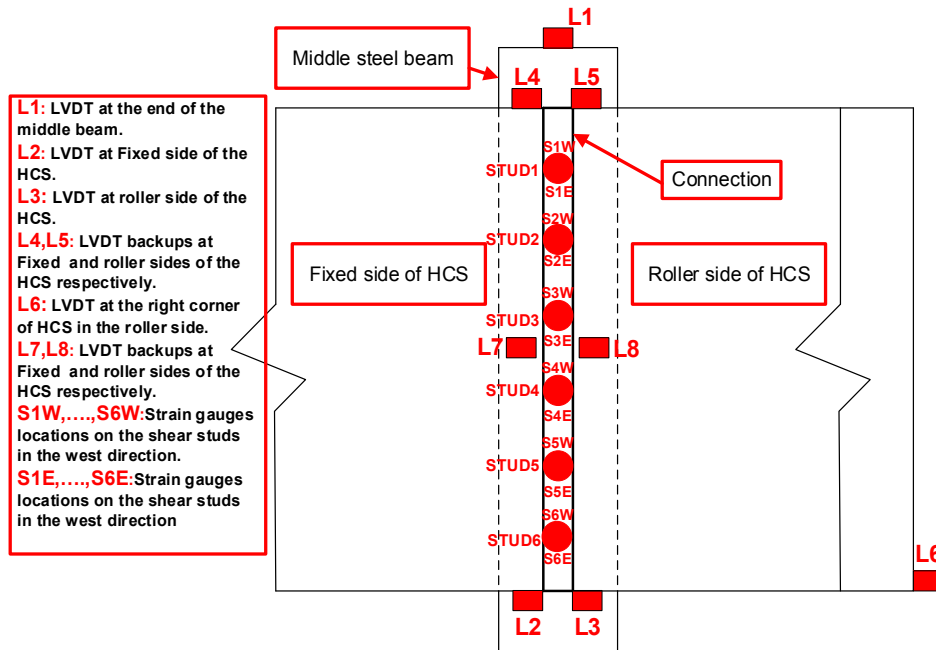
Locations layout of the studs' strain gauges and LVDTs.
